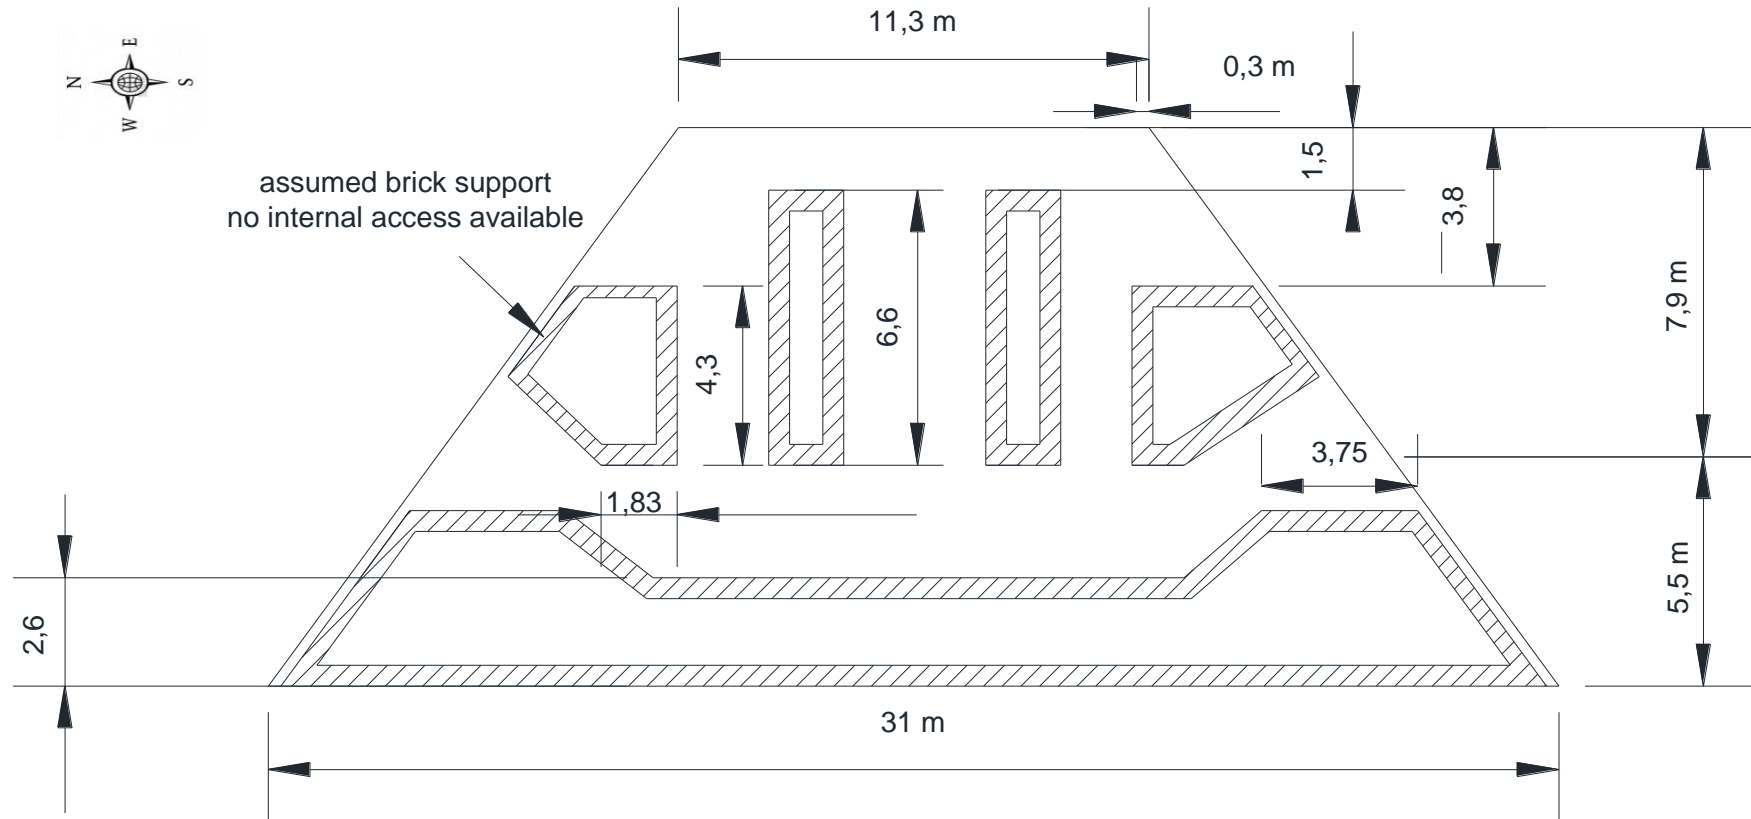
Pentagon Road Bridge Span 4 Brick wall plan view
